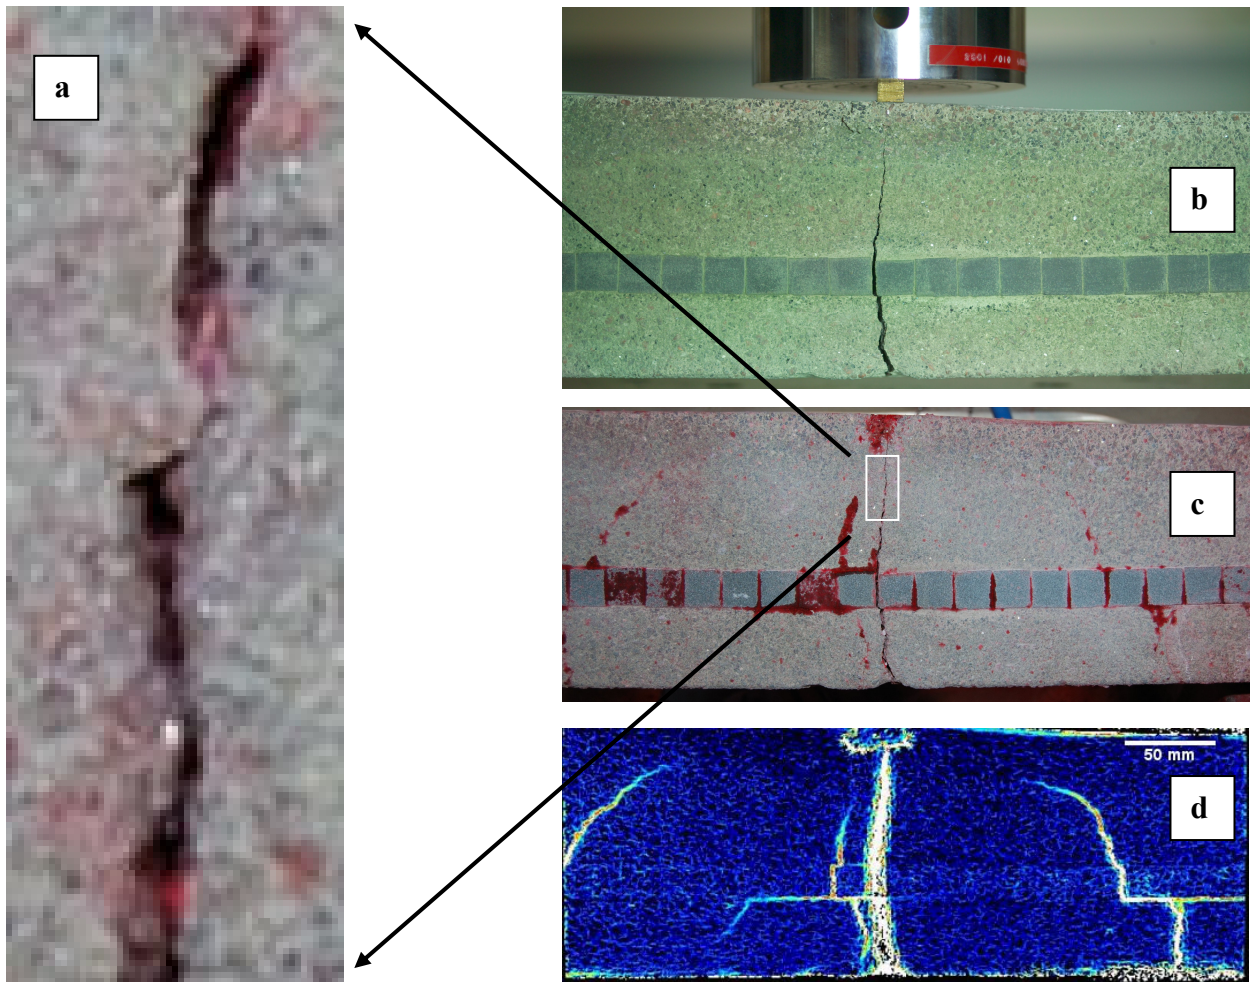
A cracked concrete specimen, Fig. 4a shows a close up of the crack in Fig. 4c. Fig. 4b shows the concrete specimen being cracked. Fig 4c shows the cracks identified using dye penetrant, Fig. 4d shows a DIC image plotting “strain” or local deformation, light areas are where there is high “strain”.
